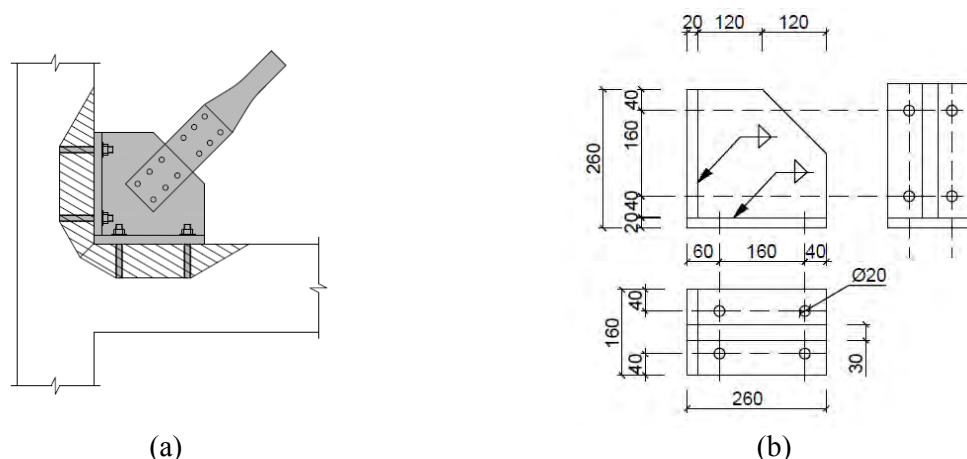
(a) Connection between steel bracing and RC members using post-installed anchors and (b) Dimensions of the connection element comprising a gusset plate and an anchor bracket. (Note: All dimensions are in mm).
